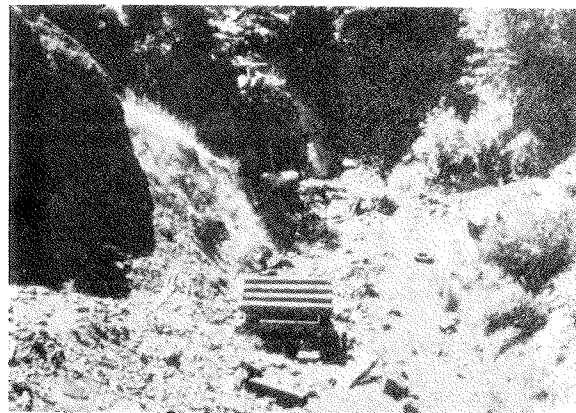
Timber debris crib in ideal location, i.e., high roadway embankment and large settling basin.
